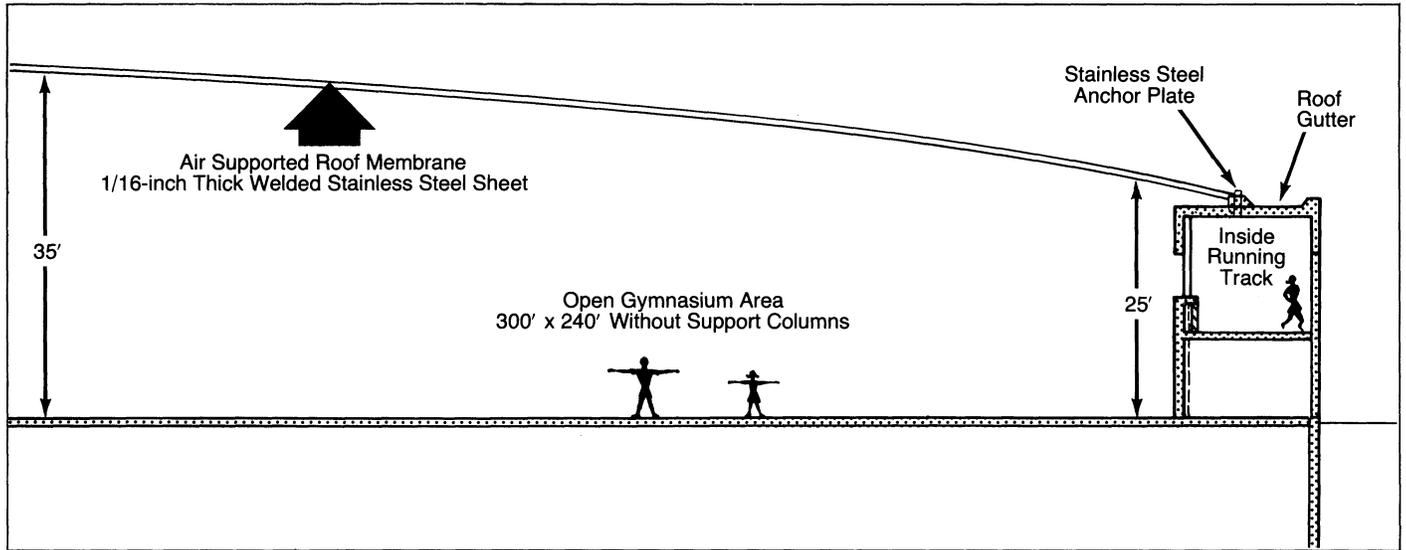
The compression ring is actually a cast-in-place concrete structure, which forms the walls and roof of the running track. Attached to a curb on top are 3/8-inch thick Type 304L stainless steel plates to which are attached membrane segments and contraction joints. The segments are welded to the plate, and another plate is bolted to the top.
